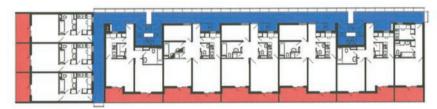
Apartment building B in Rijeka, Main floor layout, by Goran Rako, Source: Goran Rako, Architects Archives
